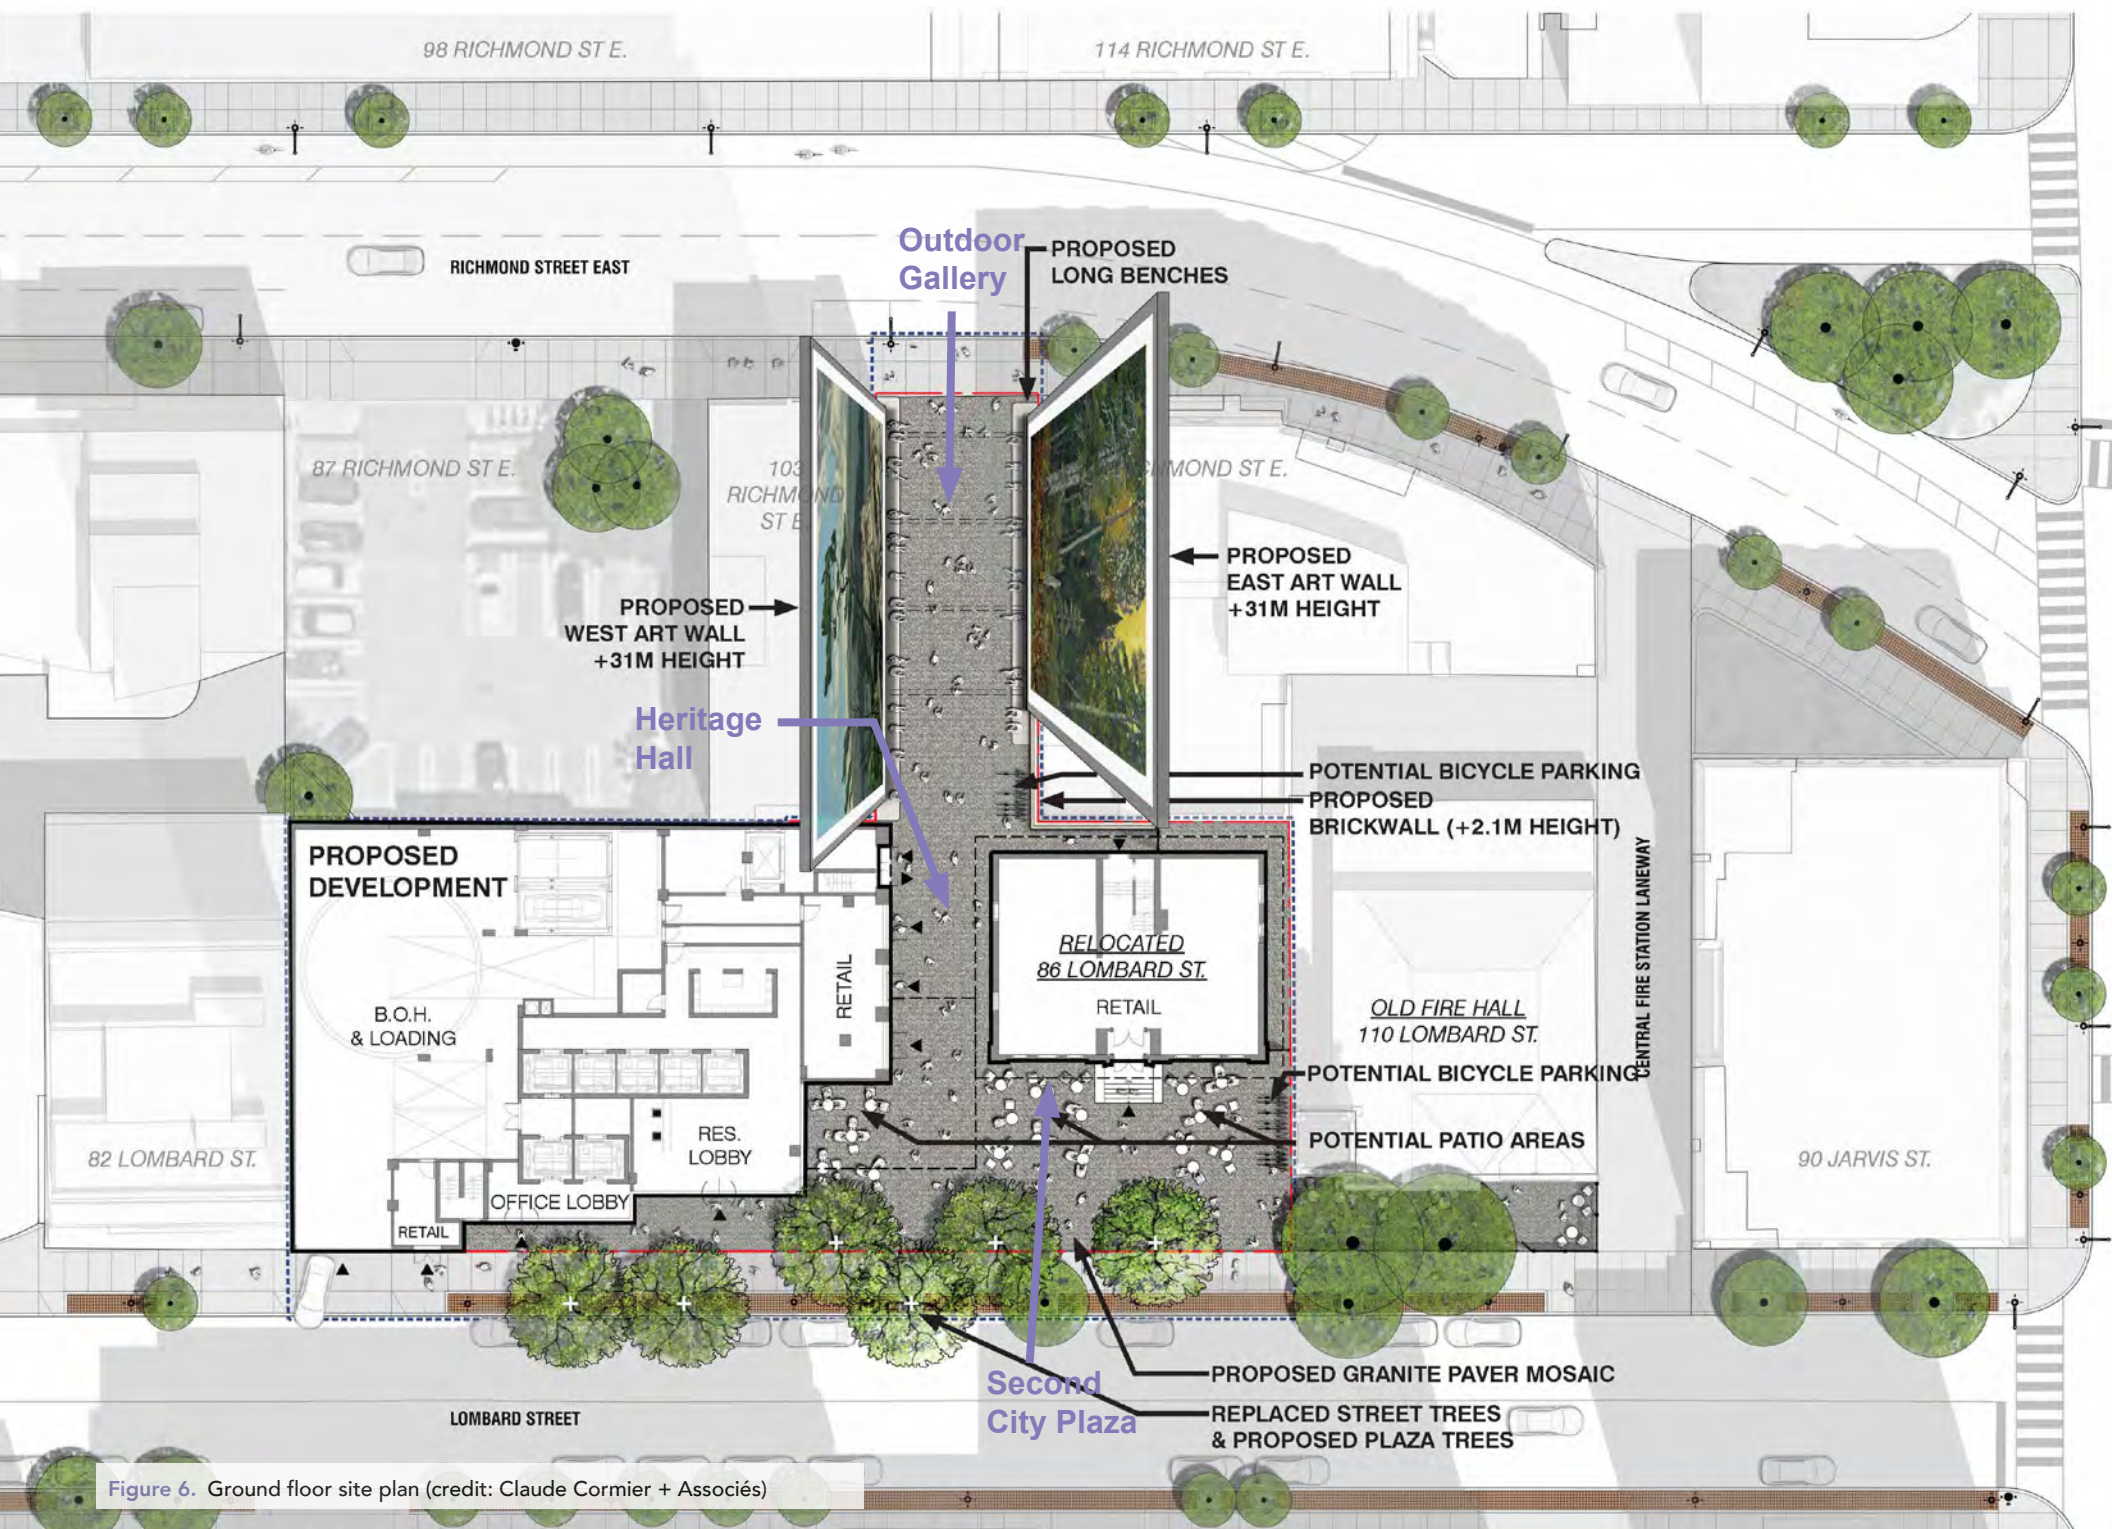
Ground floor site plan (credit: Claude Cormier + Associés)
